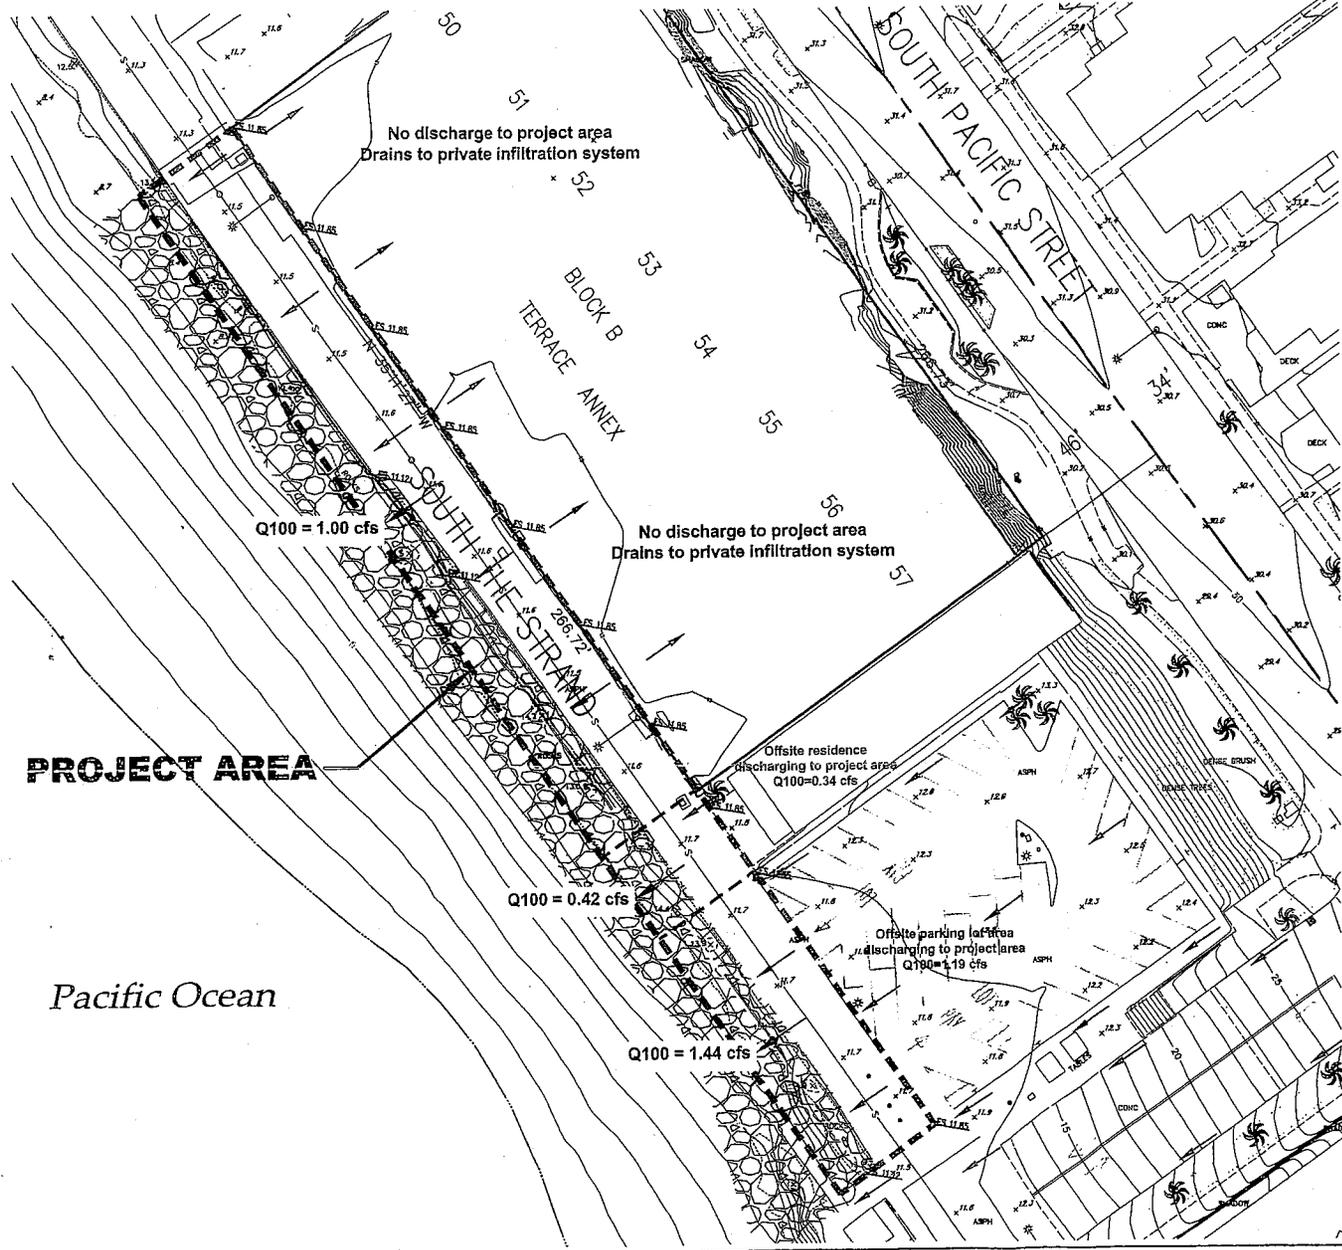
EXISTING CONDITIONS SITE PLAN AND DRAINAGE PATTERNS
